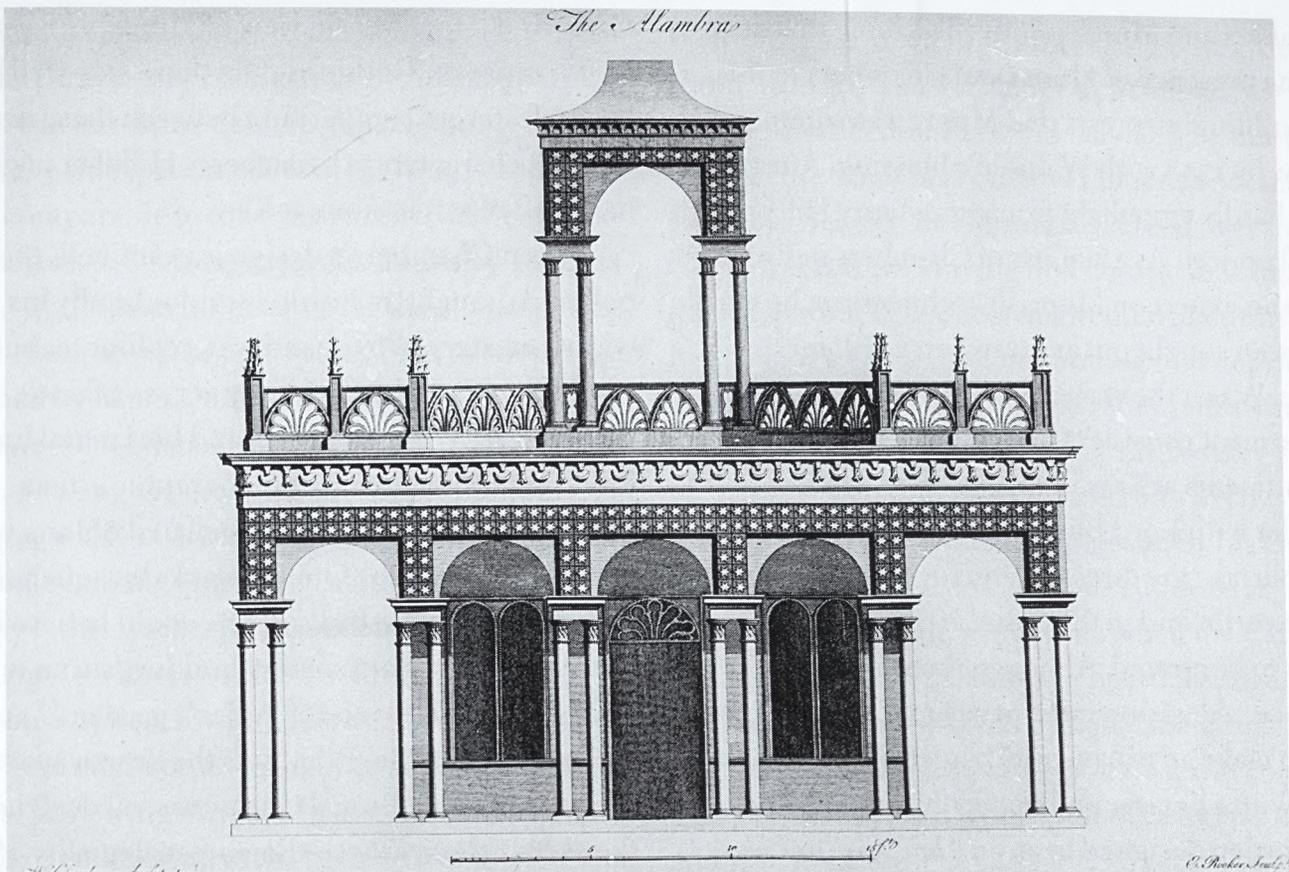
Sir William Chambers, Elevation of the Alhambra, Kew Gardens, from Sir William Chambers, *Plans, Elevations, Sections and Perspective Views of the Gardens and Buildings at Kew*, London, 1763.
